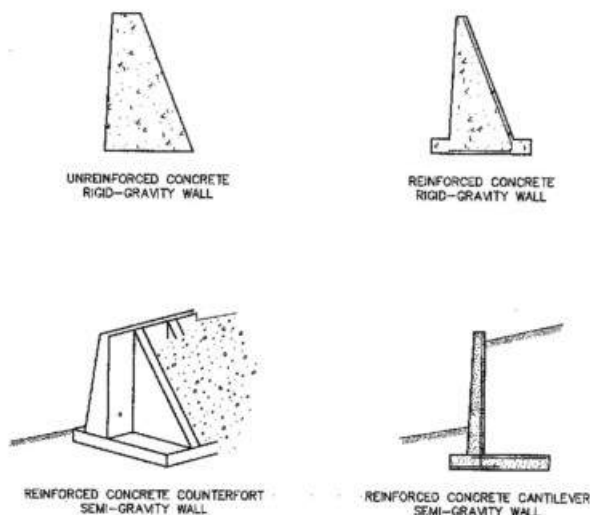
Typical Rigid Gravity and Semigravity Walls
